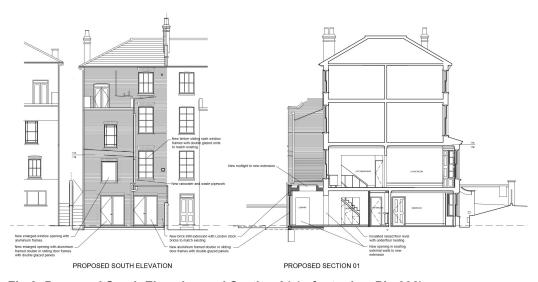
Proposed South Elevation and Section 01 (refer to dwg PL_006)
